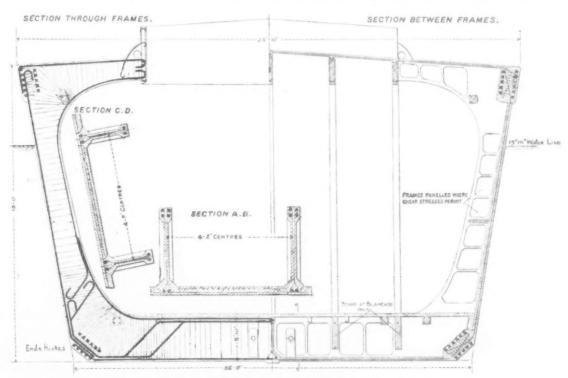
Section Through Frames of Waller Type of Reinforced-Concrete Ship
